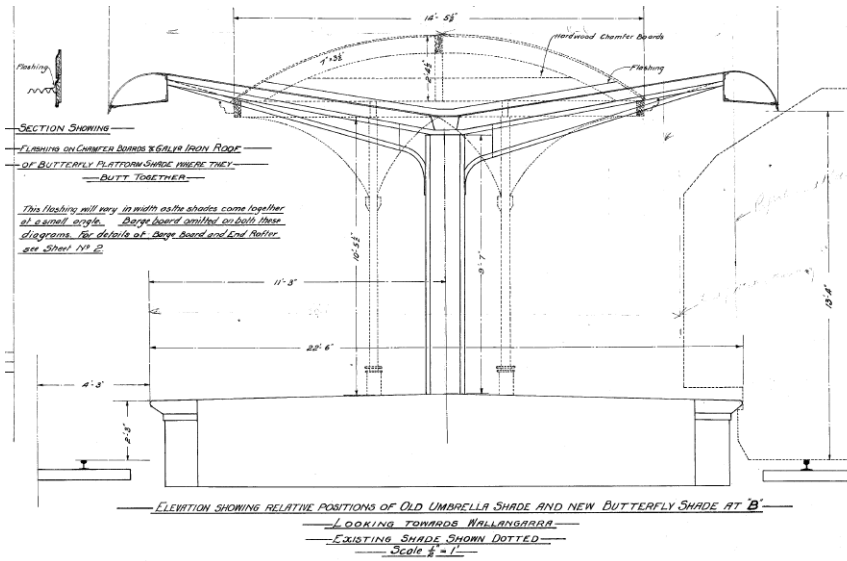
New style of platform shade in drawings dated 1925, with older curved roof awning shown behind. Source QLD Rail archive drawing no. L02377.
